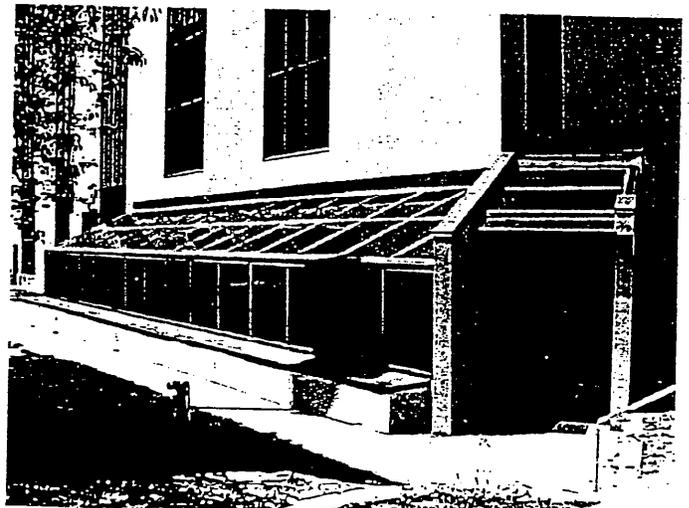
Solar heat gain and water leakage are both serious problems at the existing east atrium.
